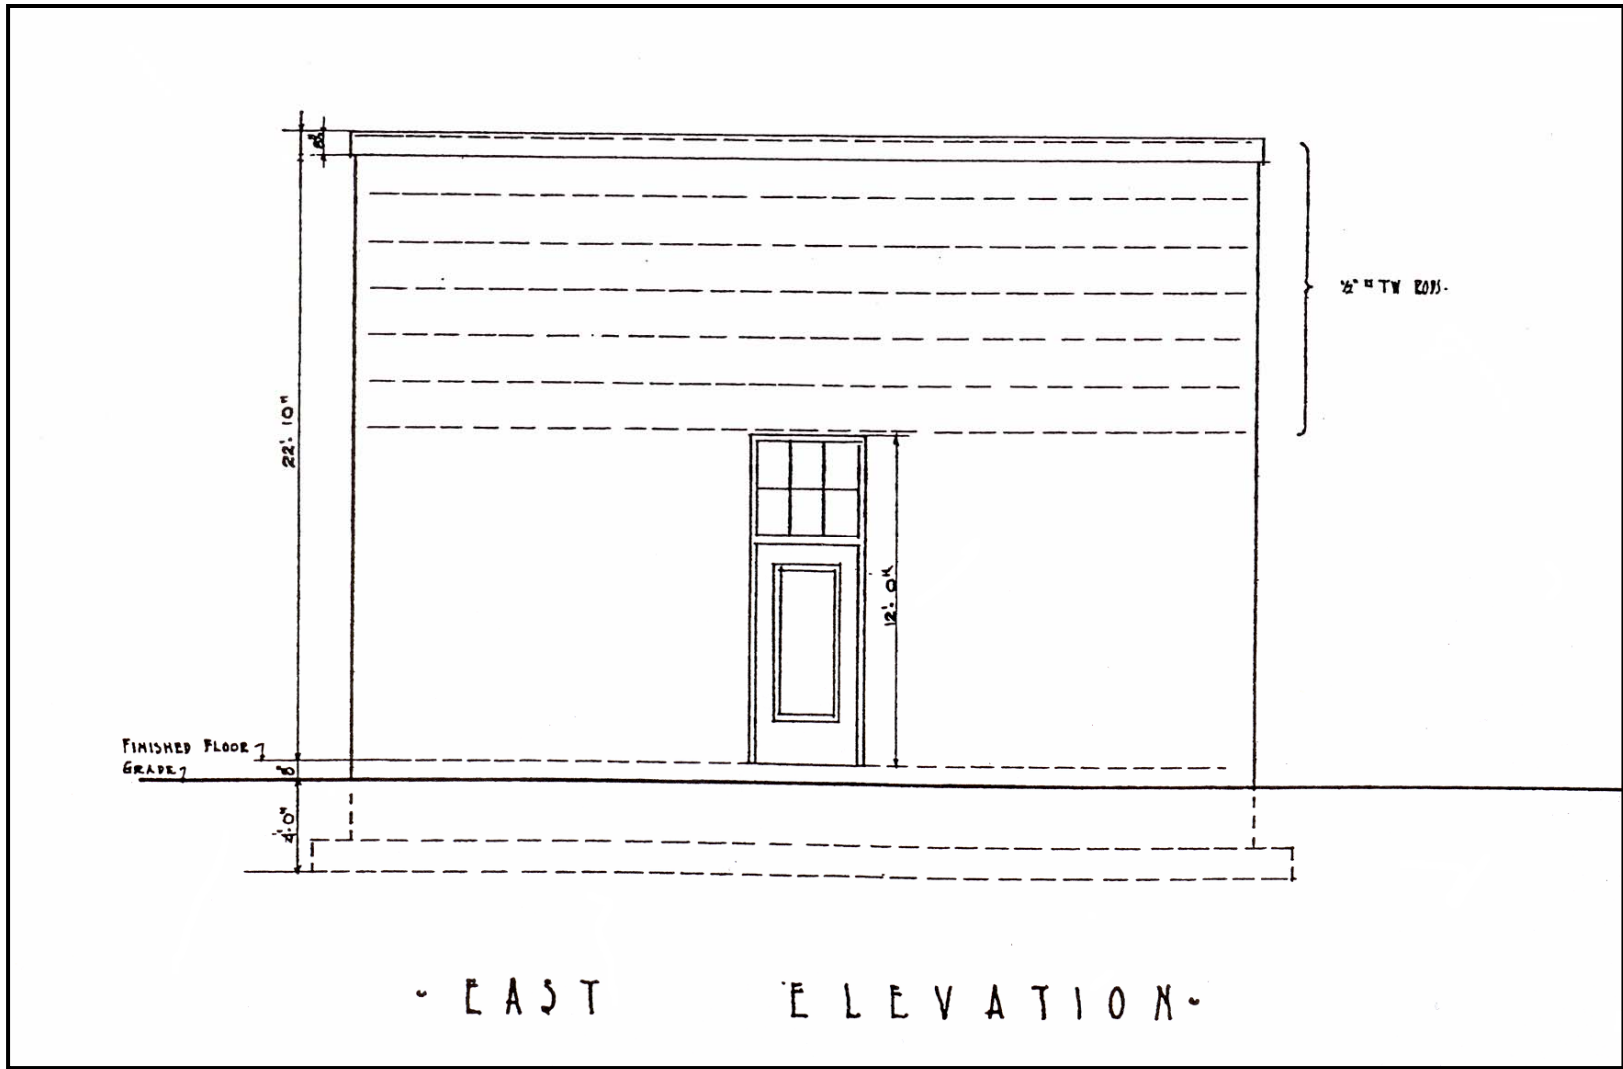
Architectural Diagram of East Elevation of Southern California Edison (San Diego Gas & Electric) Building, ca. 1917.
